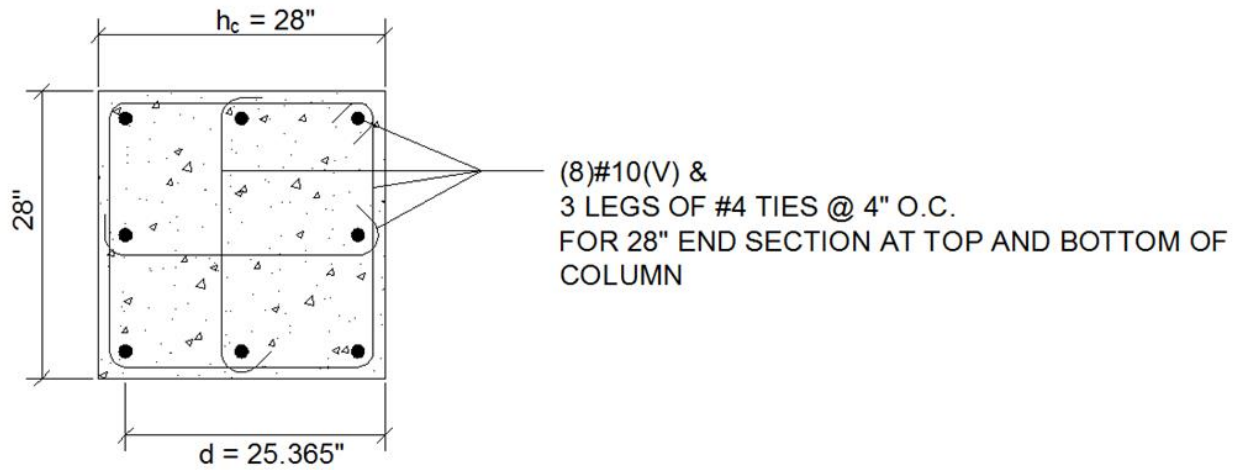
Exterior column, cross-section at end section of column at the 4th floor level based on tsunami design requirements.
